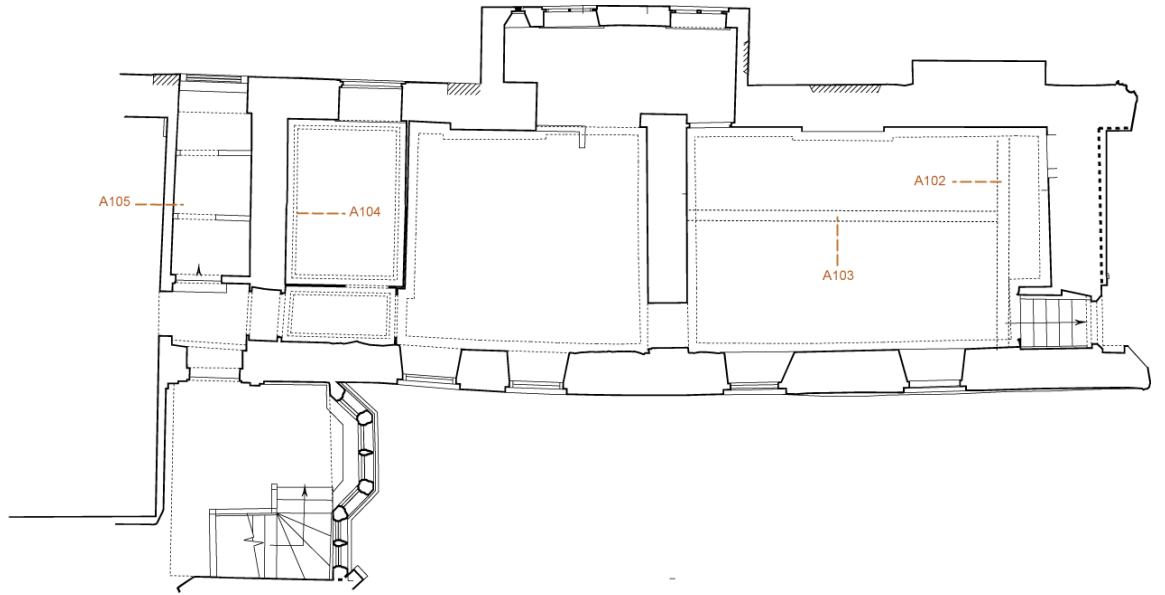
Floor N2.16–21, showing the locations samples APT-102–5
